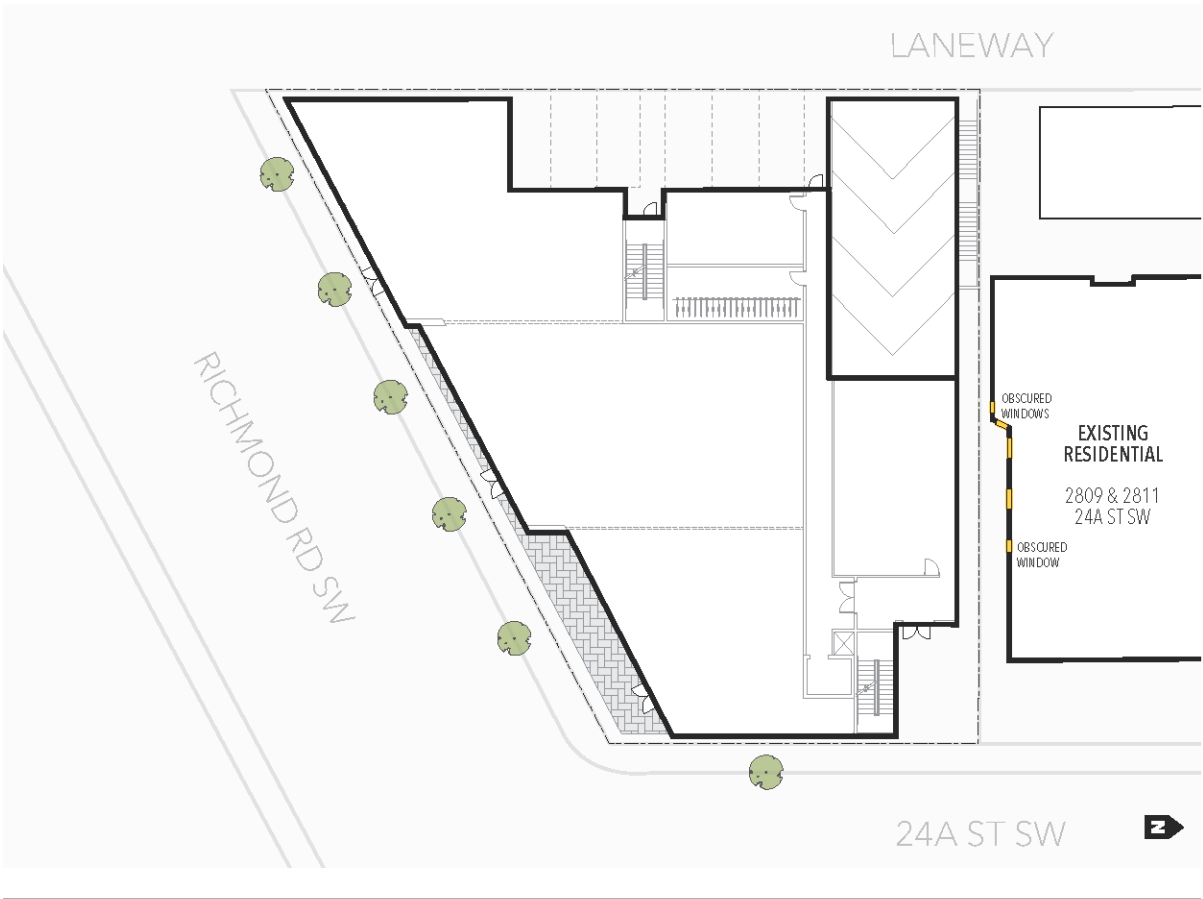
GROUND FLOOR PLAN | GROUND FLOOR WINDOWS
